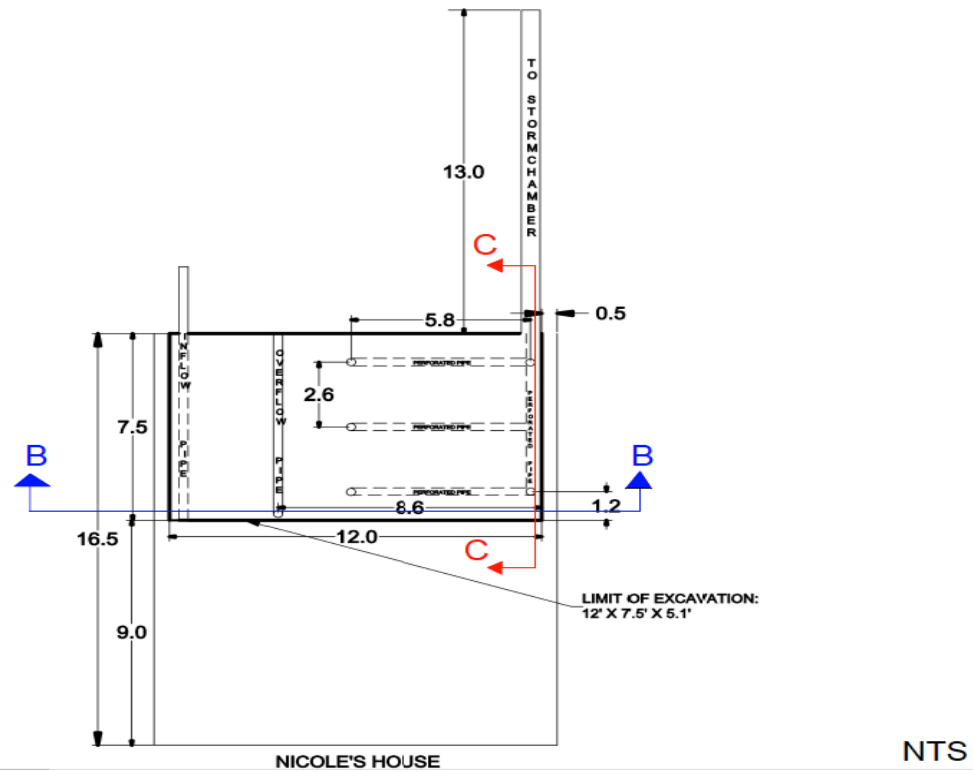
Bioretention facility pipe location -plan view (Not to Scale)
